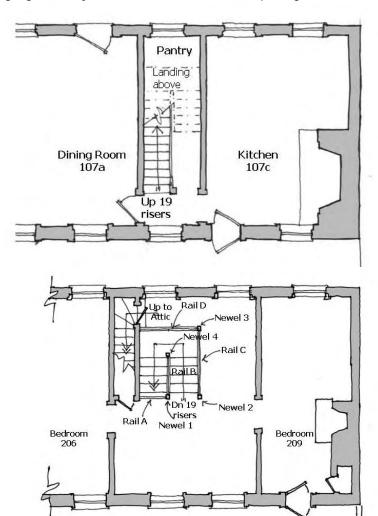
First floor plan, east end of current Room 107, showing the original arrangement of the back hall, stairs, and pantry. (GWWO, 2005)
